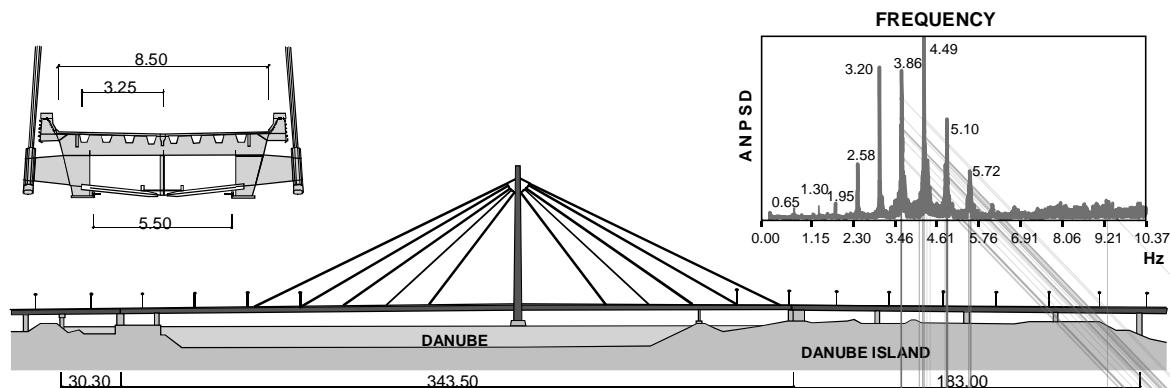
Elevation, cross section and spectrum of cable 10 N
